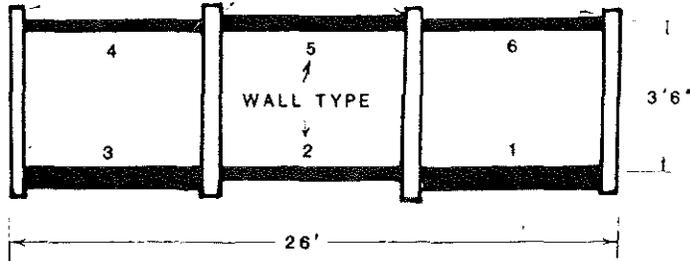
Test building allowed six wall types to be tested concurrently. Northwest testing covered five wall types, while only timer walls were tested in Canada.
